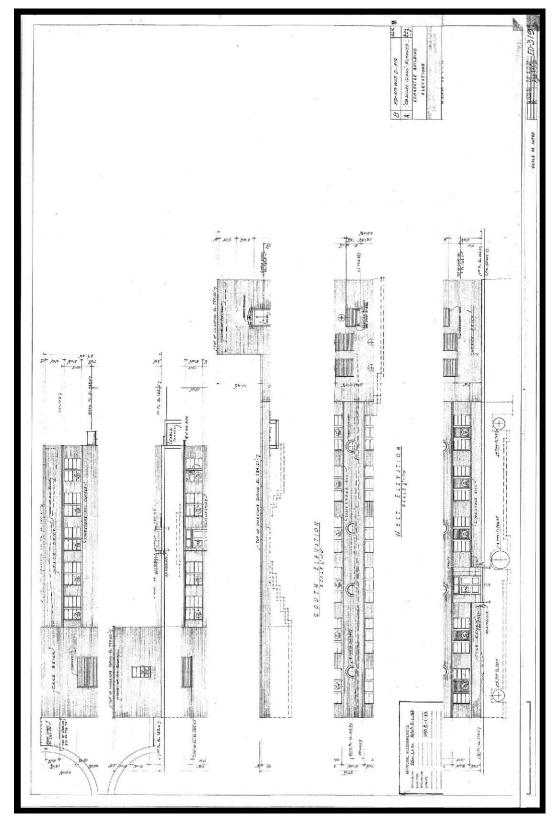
Elevation drawing of the Exhauster Building, 1942 (OH_Cuyahoga_AWT-Support_043).
